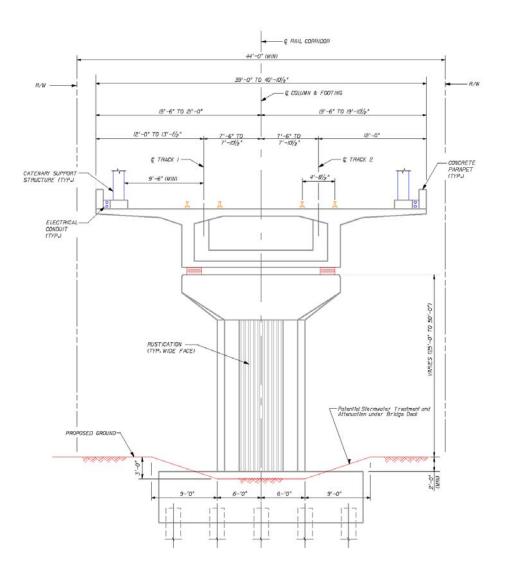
Typical Section – 44-ft., Electrified Rail Tangent, Elevated Track
